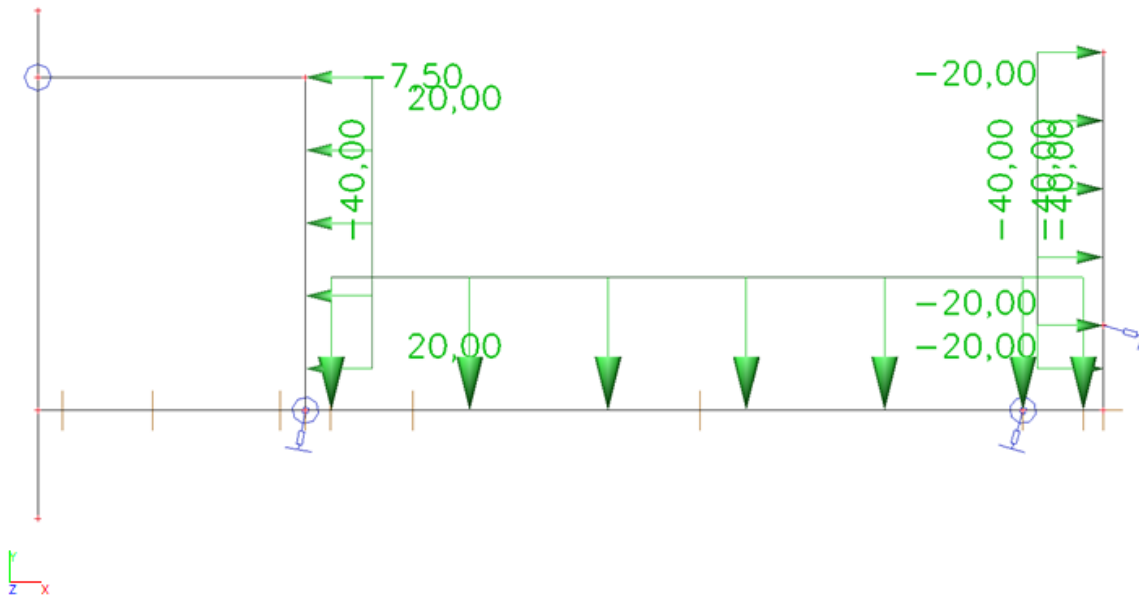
2D model: LC4-2- Terrain load above the relief floor
